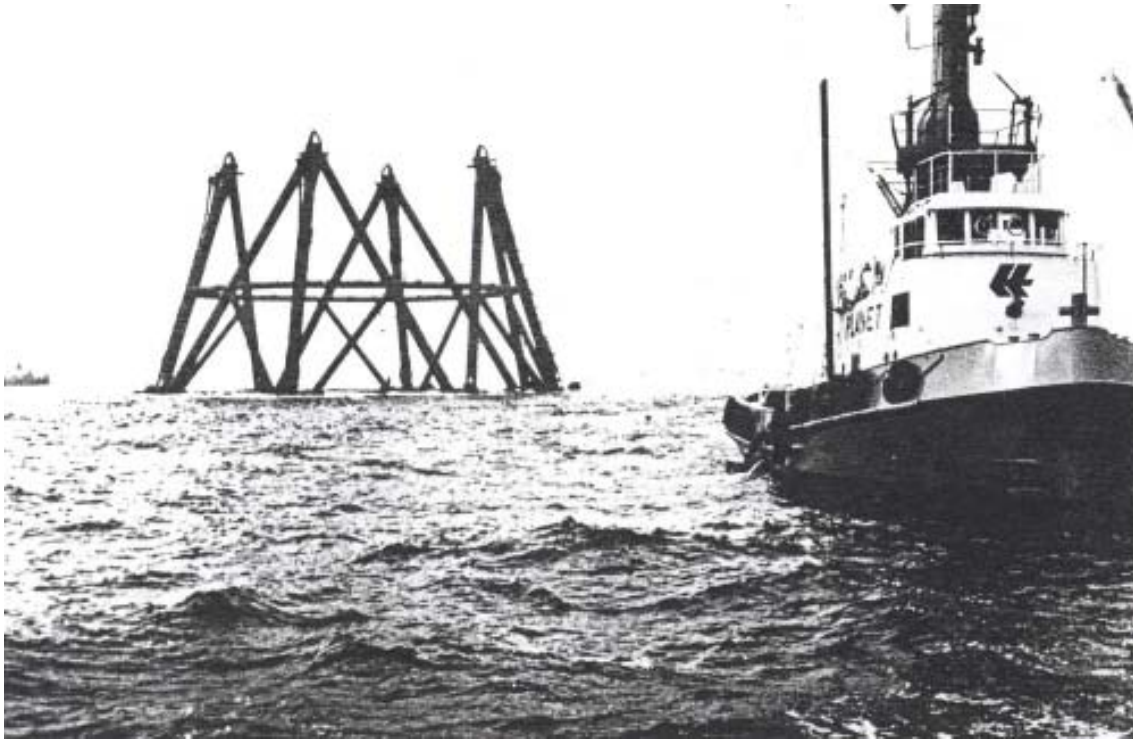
Towing of the floating foundation with the lower tubular structure to the North Sea site.
